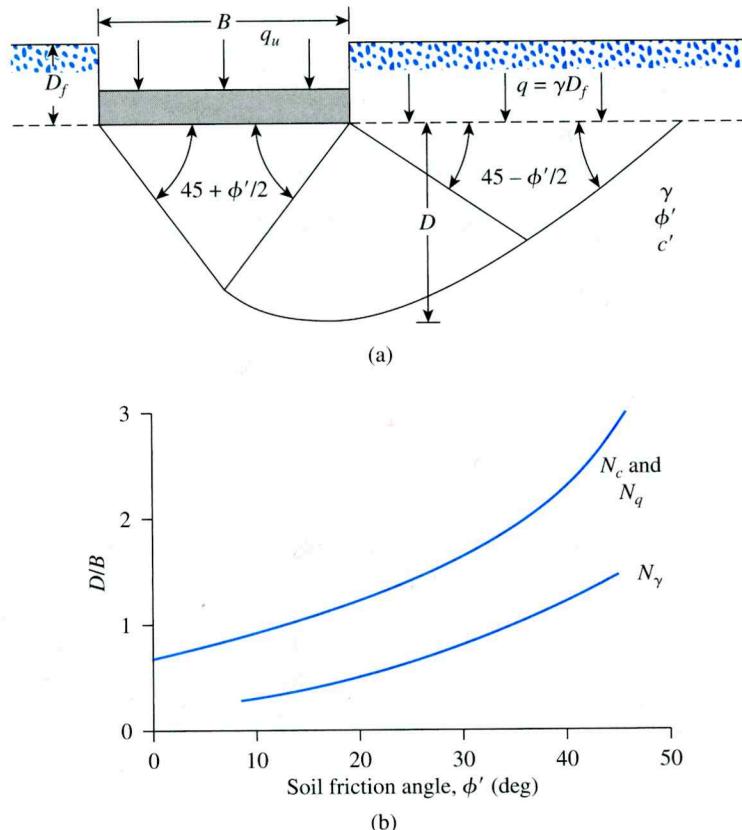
(a) Failure surface under a rough continuous foundation;
